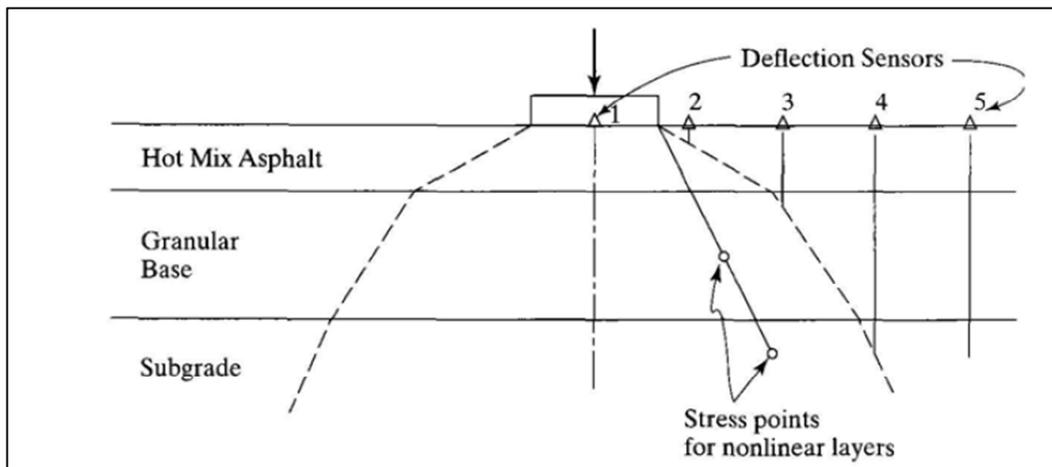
Stresszone within pavement structure (Huang, 1993)
